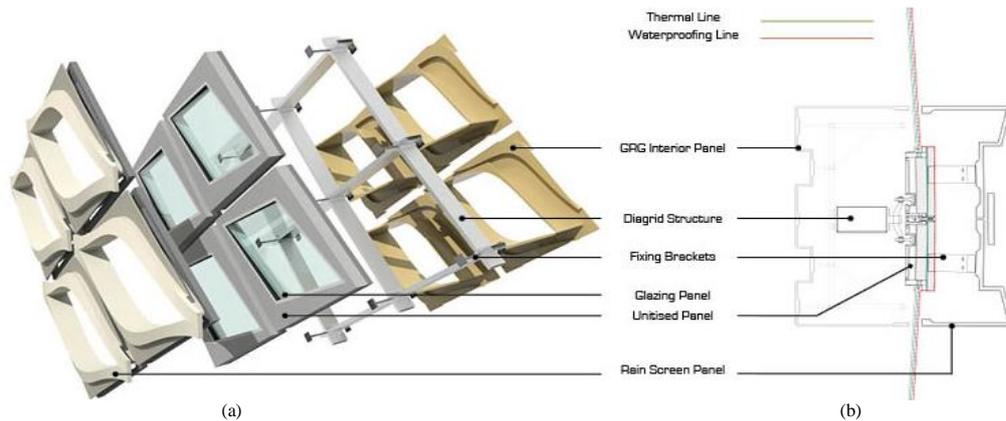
3th Design Approach: assembly of unitised system; (a) exploited view (b) cross-section detail.
